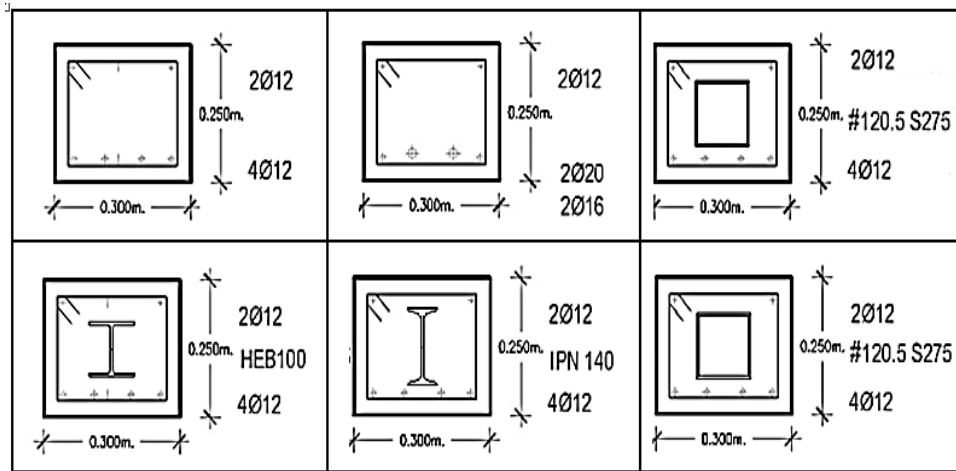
Specimens cross-sections and strengthening schemes (Montava et al., 2019)
